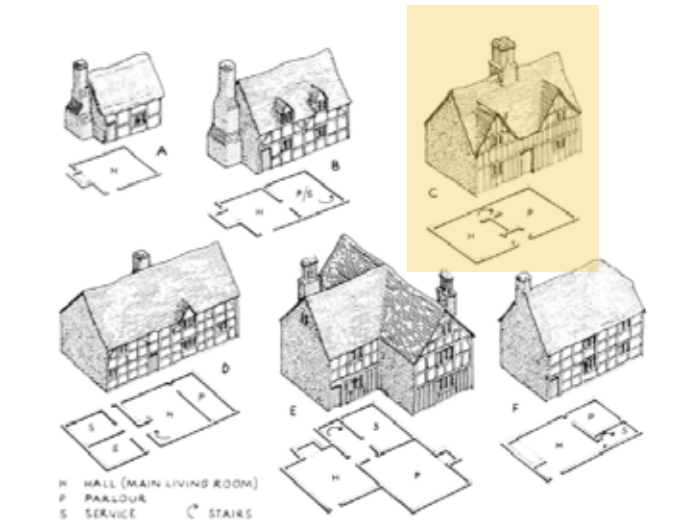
Post-medieval houses. A: one-room plan. B: two-room plan. C: lobby entrance plan. D: cross-passage plan. E: T-shaped plan. F: end lobby entrance plan, with two inner rooms.
